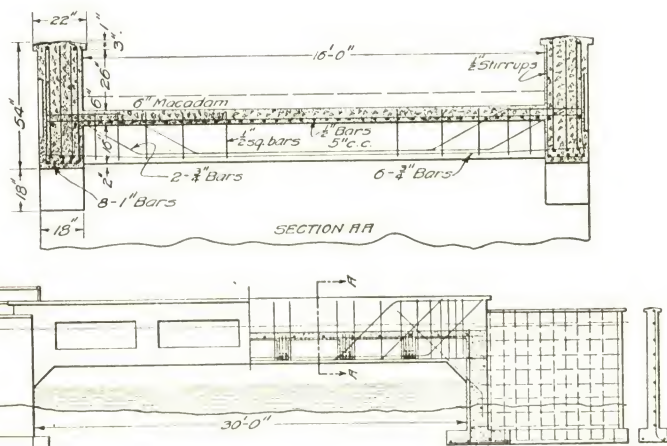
A. Details of Girder Bridge near Allentown, Pa.
